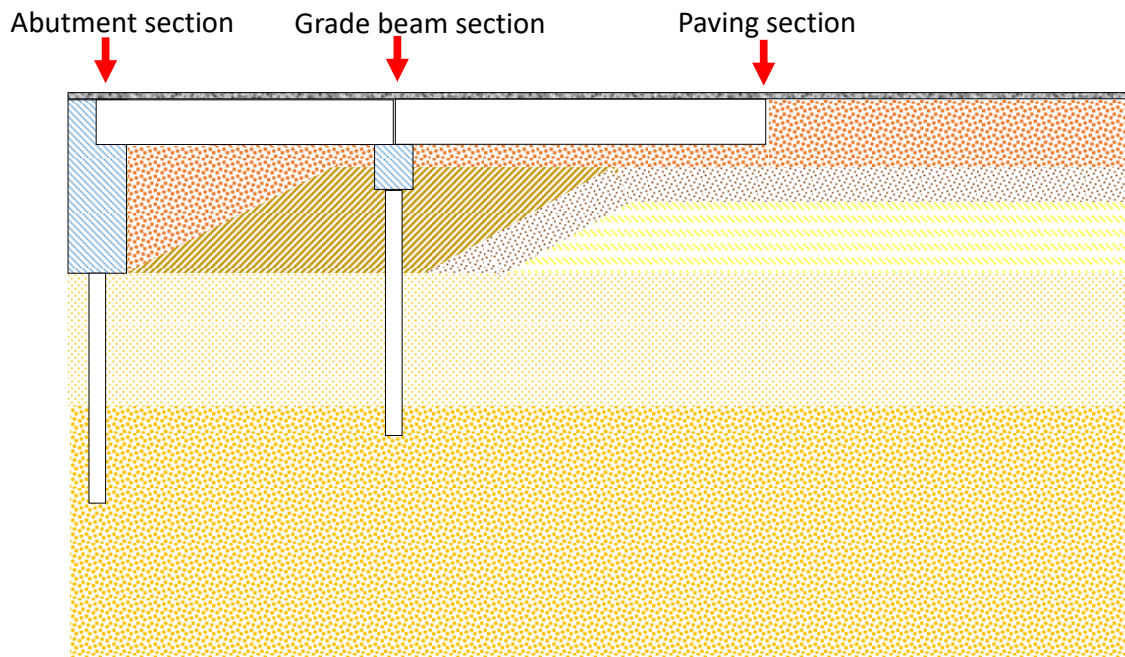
A schematic drawing that shows the location of the abutment (AB), grade beam (GB) and paving sections.
